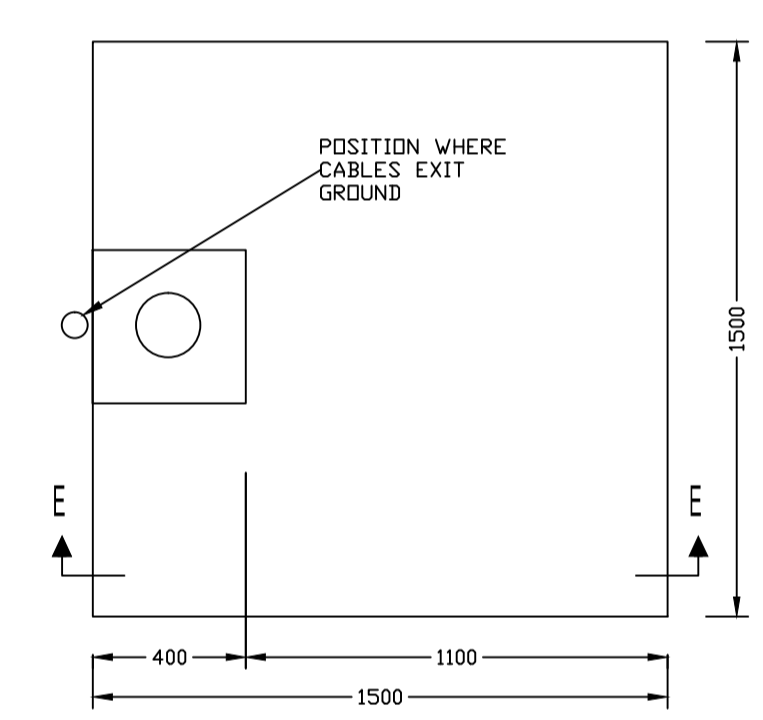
E: TYPICAL CABLE CONNECTIONS AND FIXING OF SIGNAL HEADS
